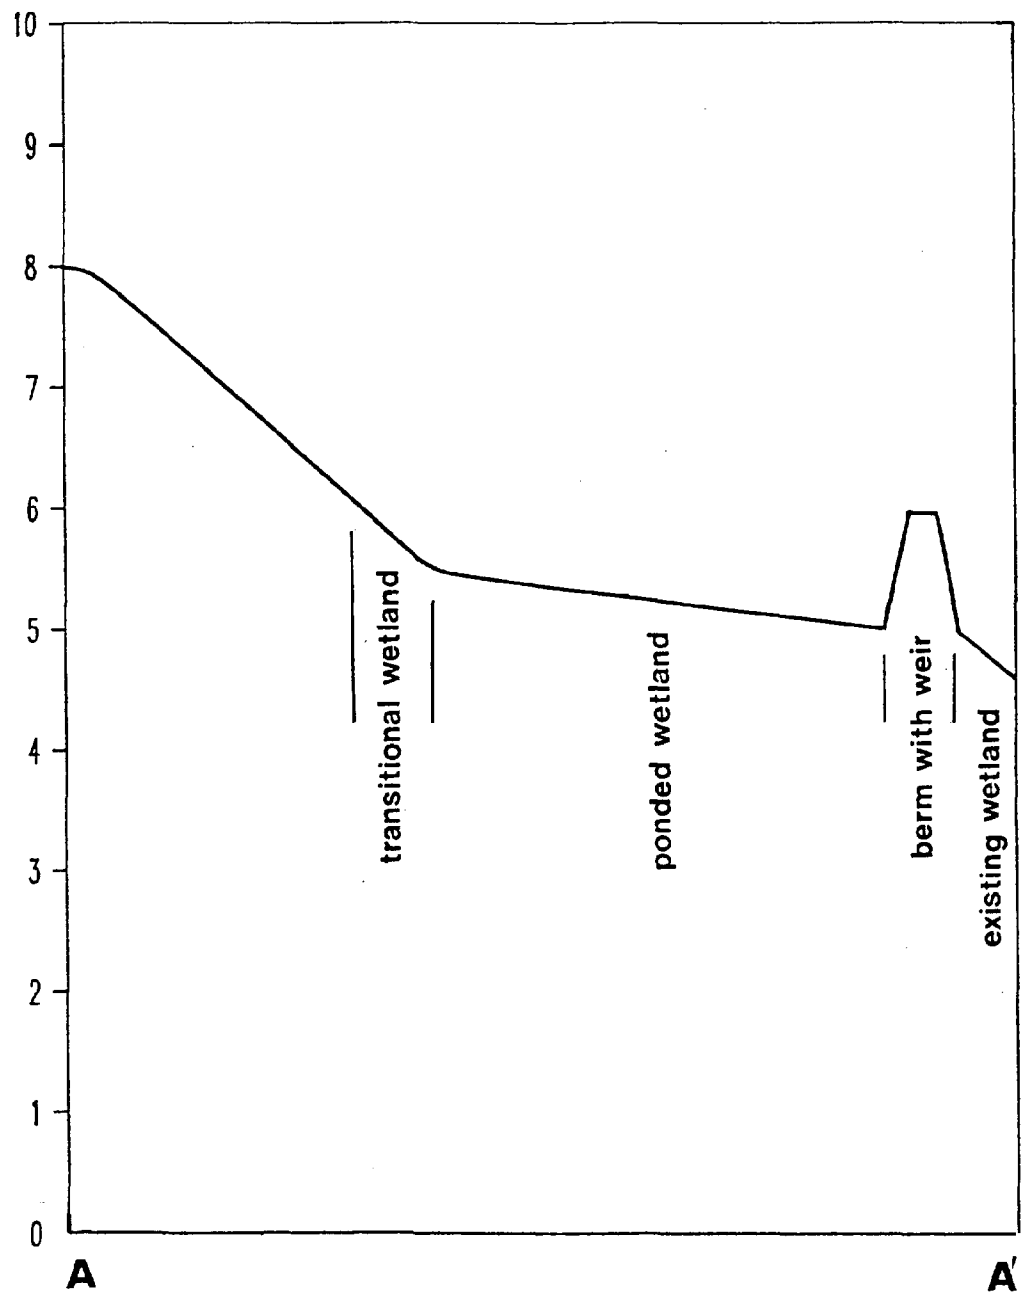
Grading plan for mitigation site M-6A for typical cross-section A - A'. Berm has weirs placed as shown in Figure 8.
